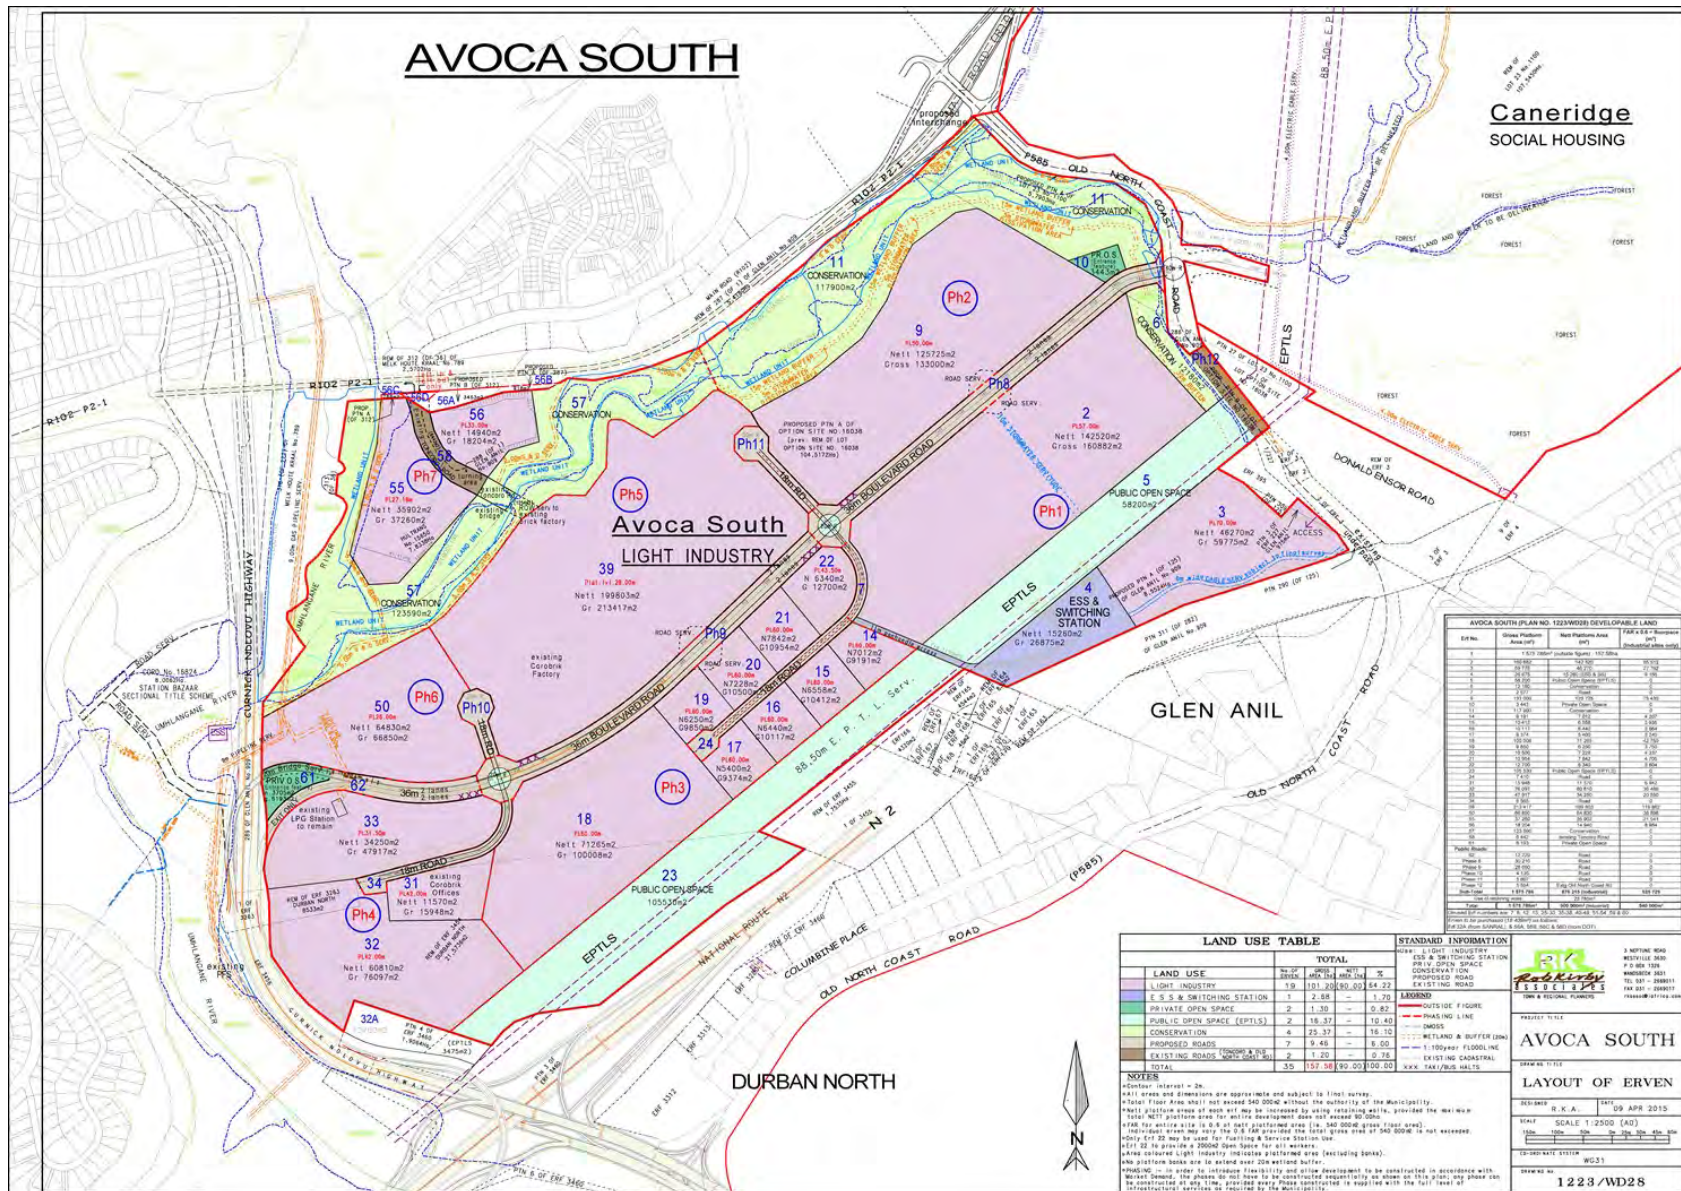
Proposed Layout Option 5 - Drawing No. 1223/W28
